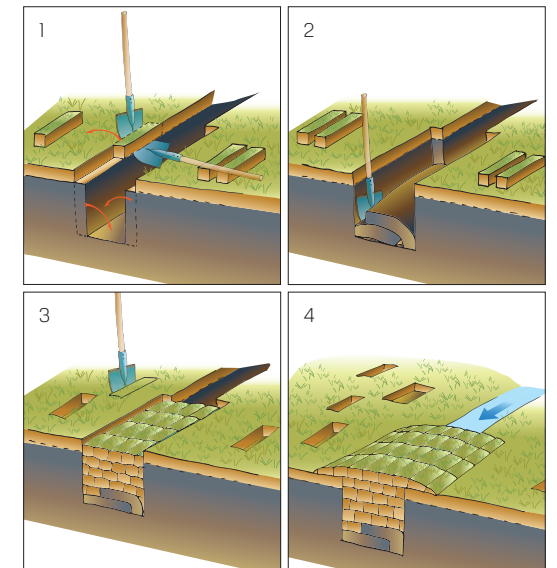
The course manual construction of a peat dam. Such dams are suitable for small, narrow ditches where access with an excavator is difficult or impossible. Drawing: D. Segliņa (according to Anon. 2014a).
